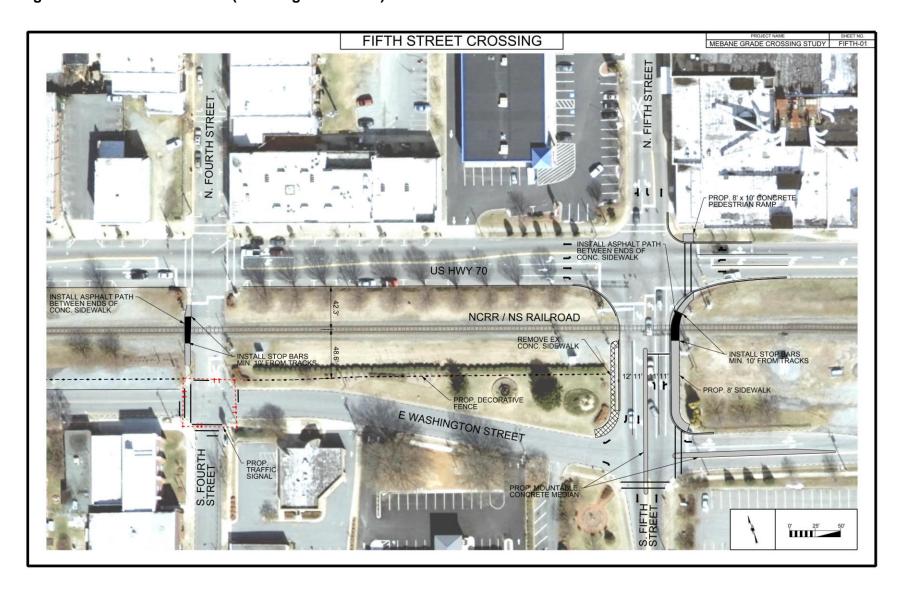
Example of a Mountable Concrete Median that could be installed on 5th Street
